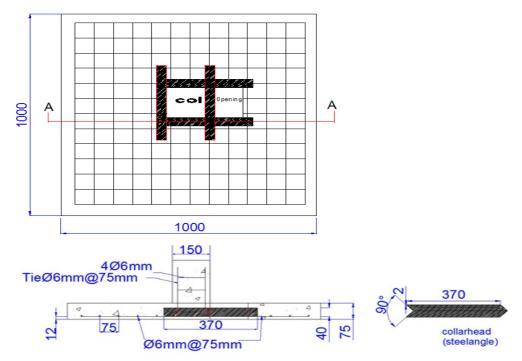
Dimension and Layout of Slab with Collar Head all sides of col NO4
